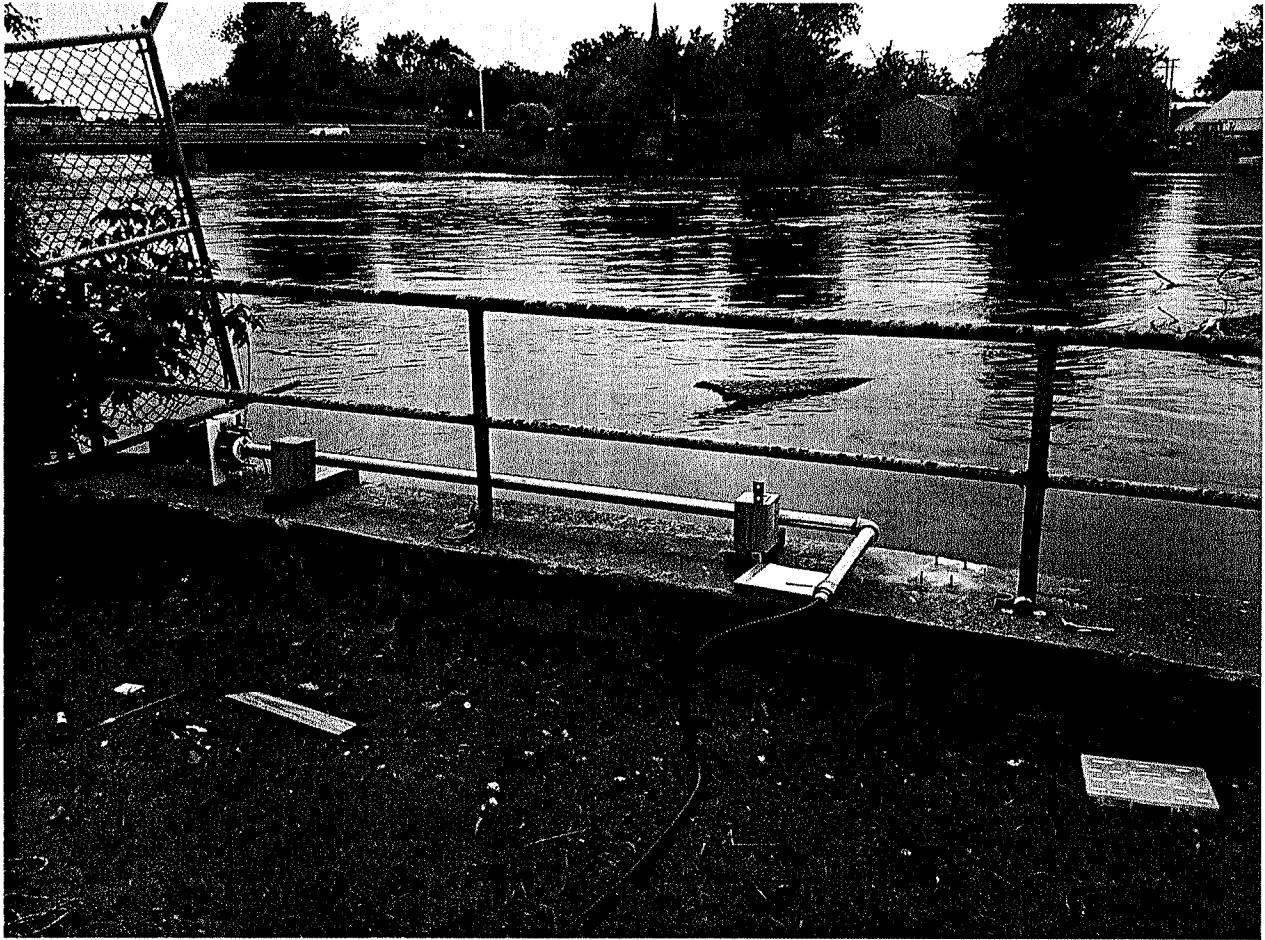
Bulkhead installation of water level sensor on St. Regis River, Hogansburgh, NY at the Brookfield Hydroelectric Plant. Once, mounted the rigid conduit is secured to the bulkhead using concrete anchors.
